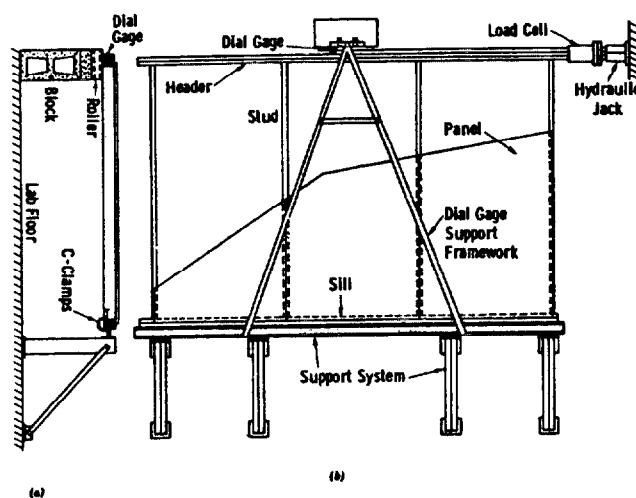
Shear Wall Test Setup: a) Side View; b) Plan View (after Easley, Foomani, and Dodds, 1982)
